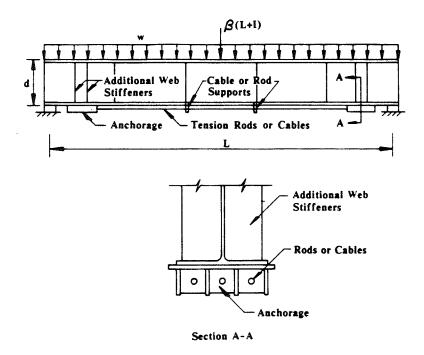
Elevation View of Girder with Redundant Cables or Rods
